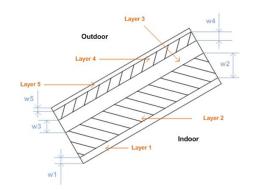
DRAWING OF THE CEILING OF ESTÓS HUT
